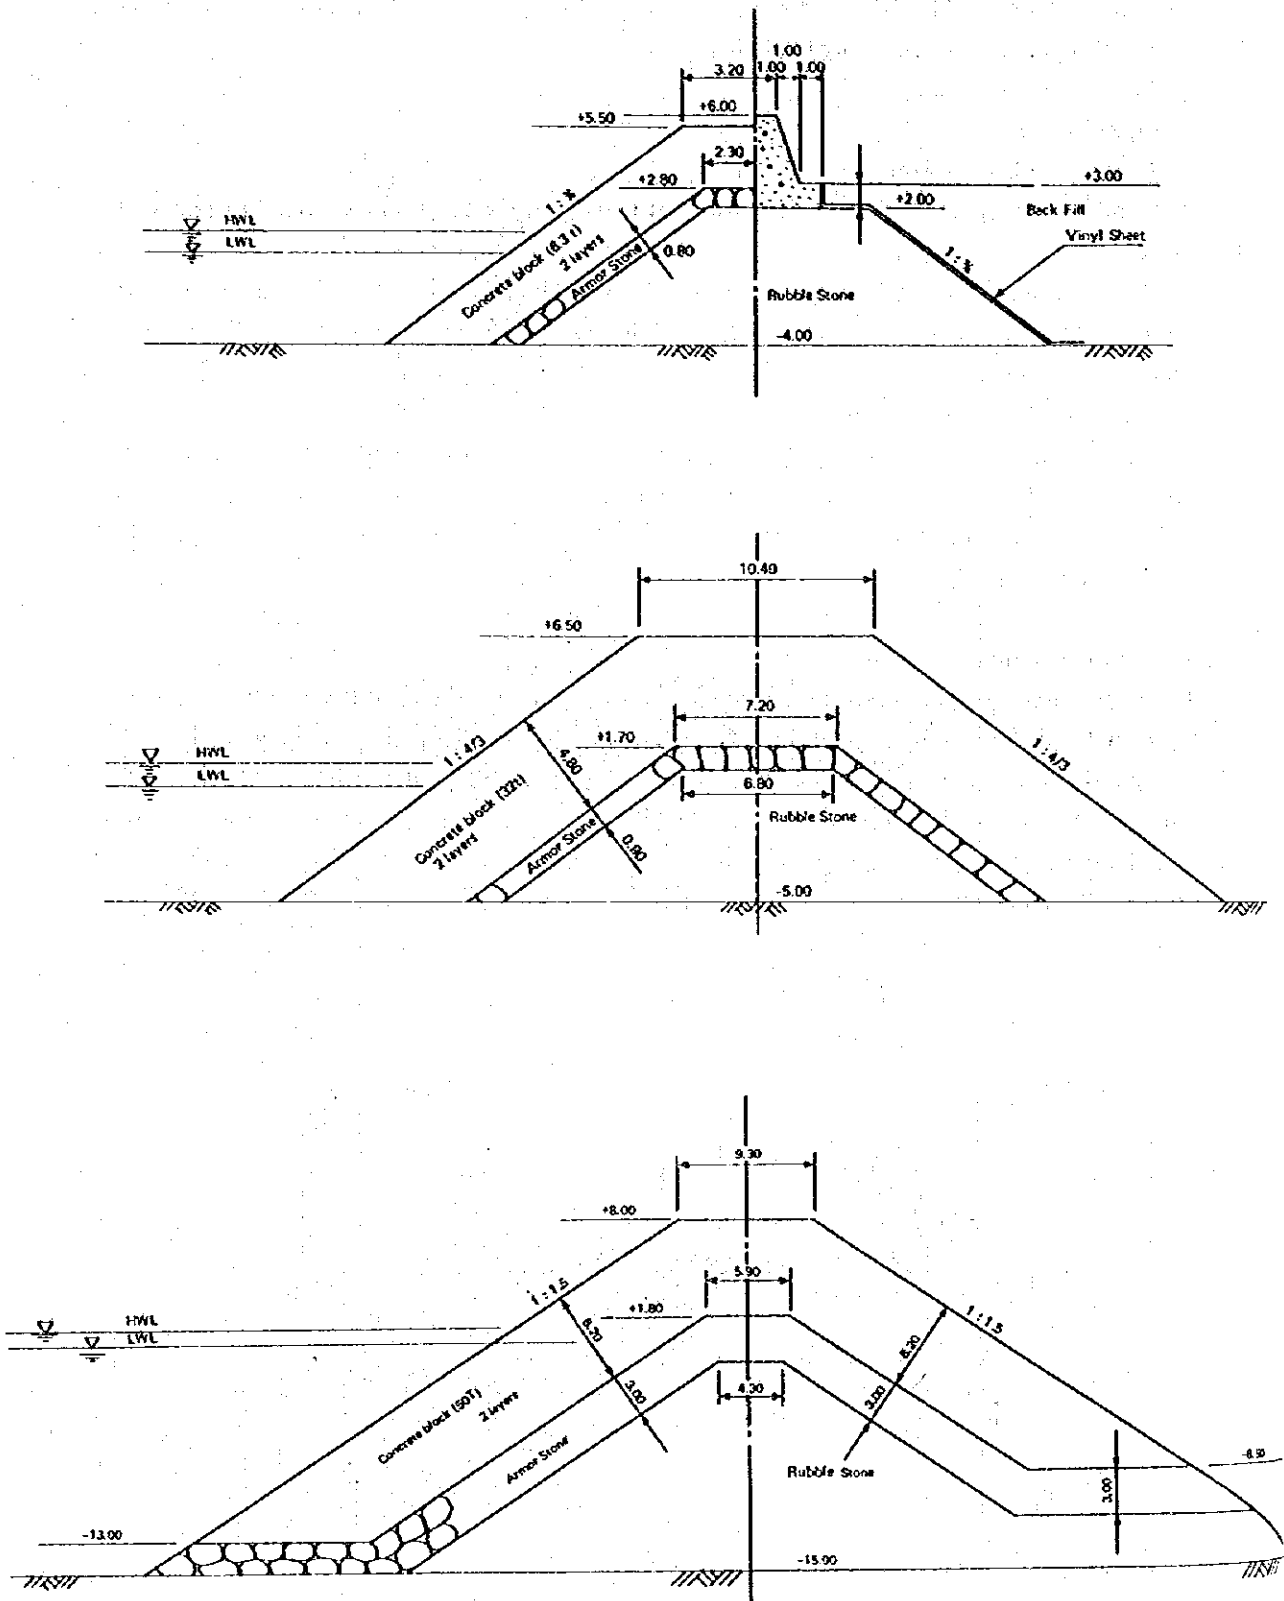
Typical Cross Section of Breakwater and Revetment
